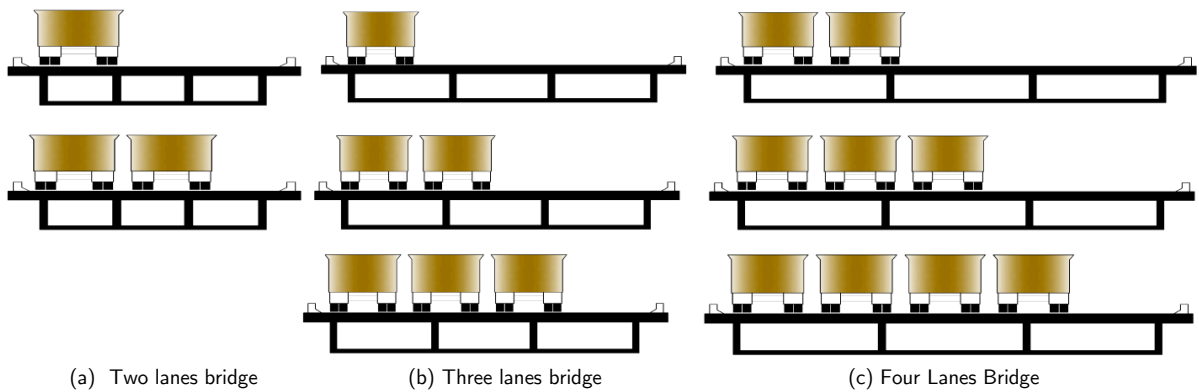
LRFD HL93 loading cases in the transverse direction of the bridges for two, three and four lane loading
